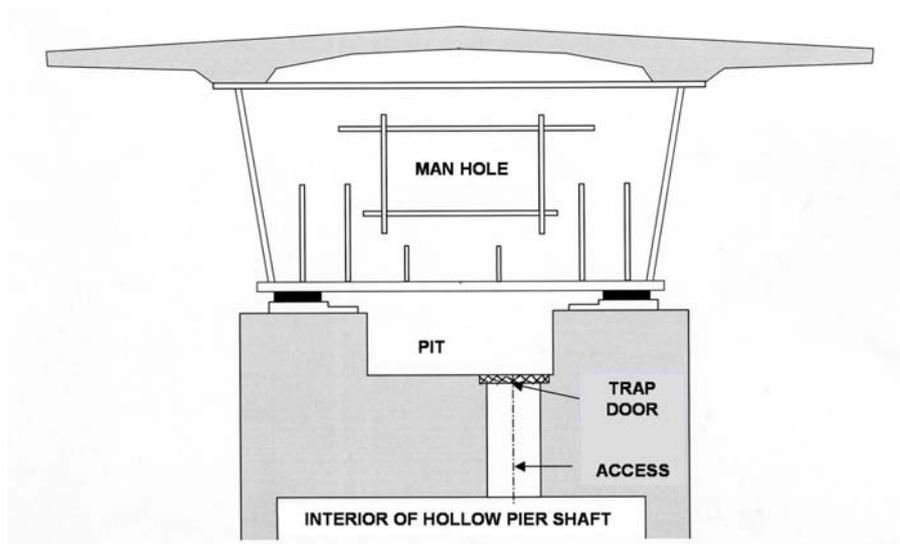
Example of pier head with a pit and access to hollow pier shaft
